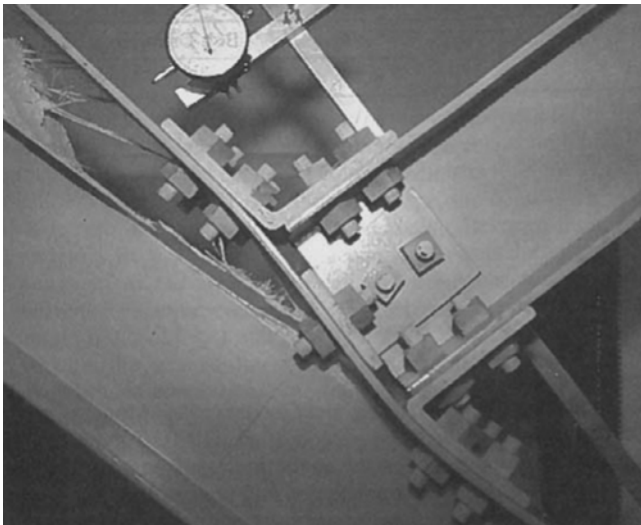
Premature failure of PFRP beam-column connections without web-flange transfer elements.
